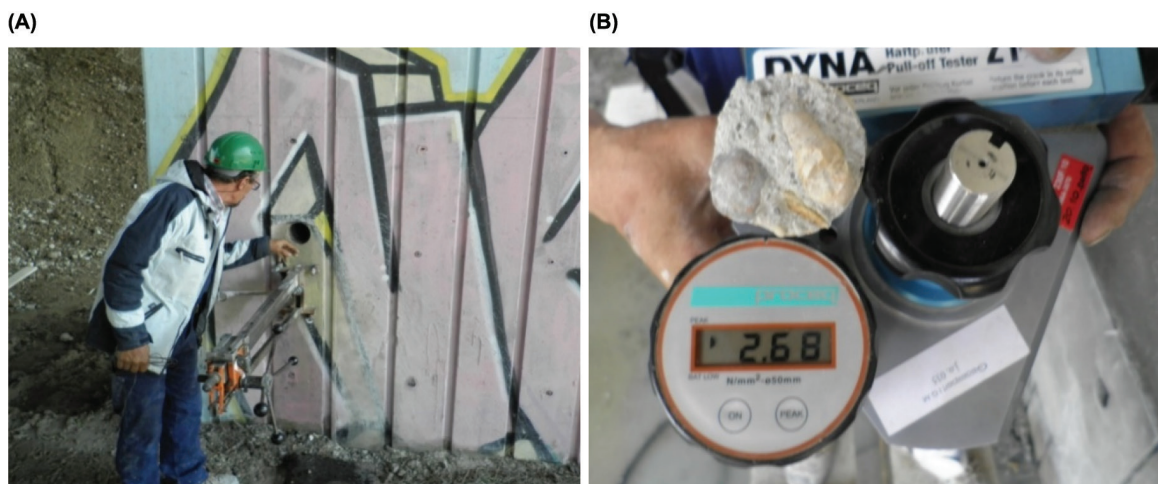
Testing of concrete before repair: (A) coring of concrete; (B) pull-off test.
